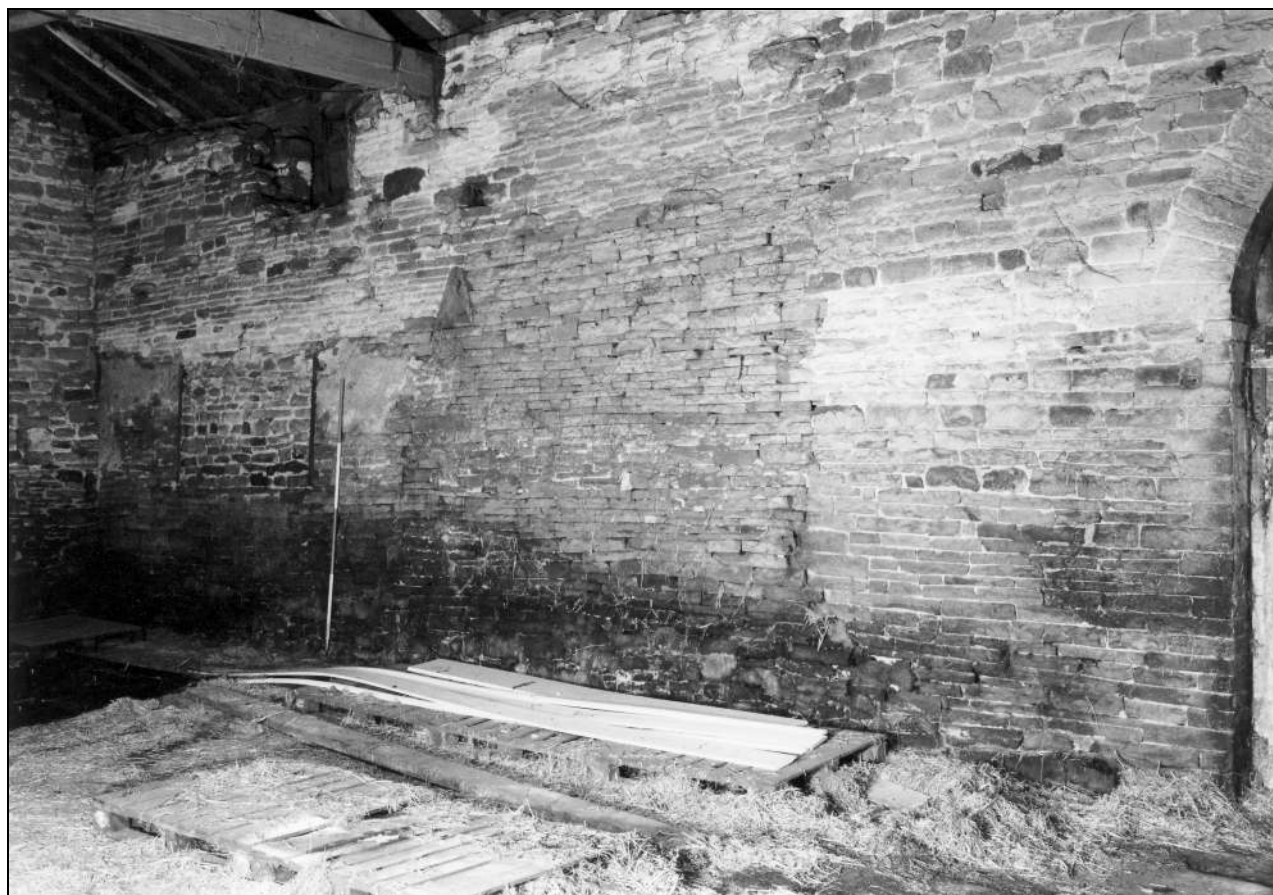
North end of east wall, inside barn, showing areas of disturbed and rebuilt stonework (film 4, frame 18)
